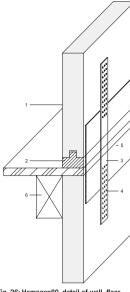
Homogen80, detail of wall-floor junction 1) Homogen80 wall system 2) Timber sole plate 3) Nail plate 4) Annular-ringed shank nails 5) Seal in butt joint between panels 6) Erde beam
